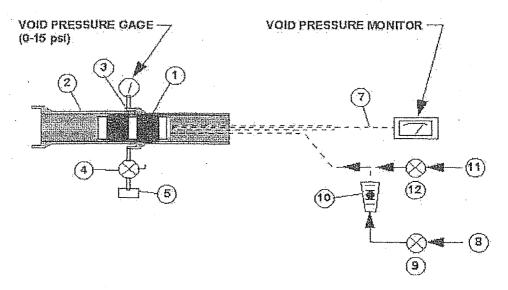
PIPE JOINT TESTING EQUIPMENT & CONTROL TEST SETUP
